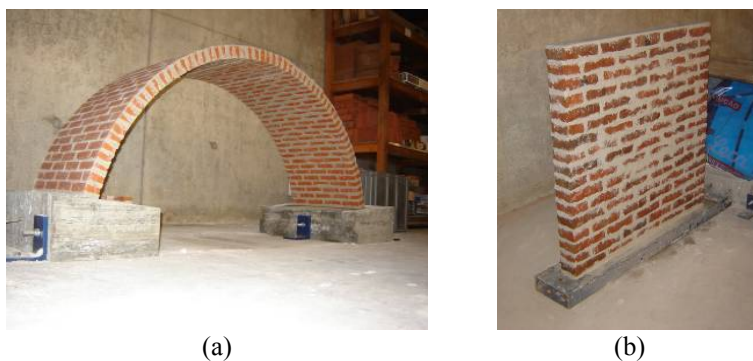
Masonry replicates: (a) arch model; and (b) wall model
